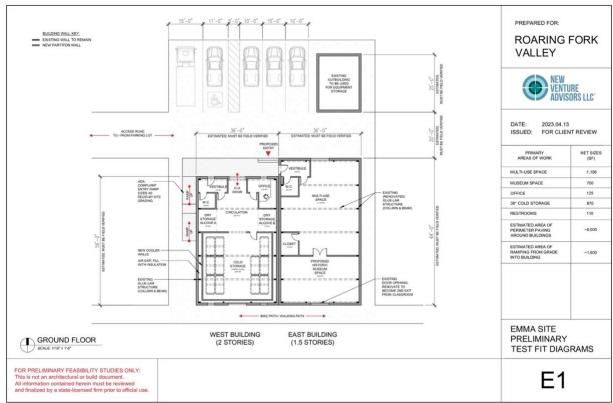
EMMA STORE BUILDING SITES MODEL 1 DESIGN
